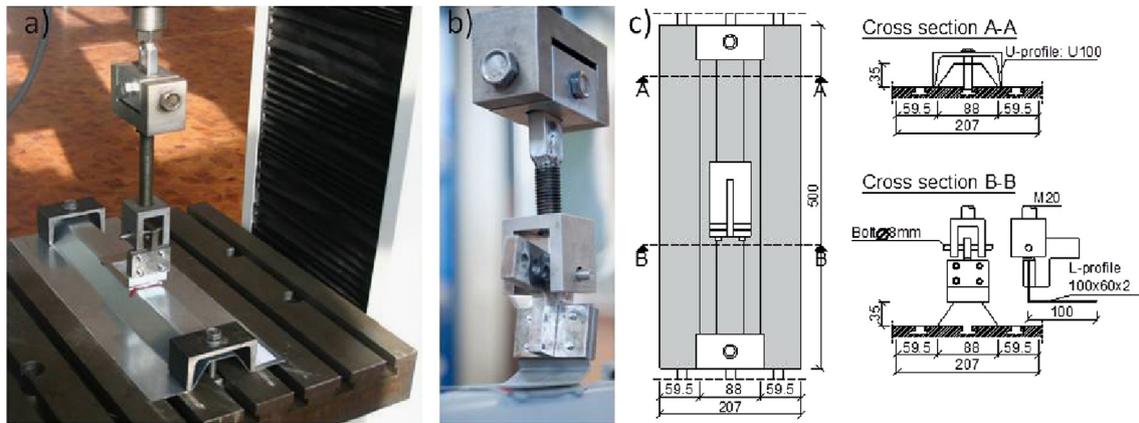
(a) Test setup: façade connection, (b) detail: L-profile, (c) technical drawing: dimension in mm.
